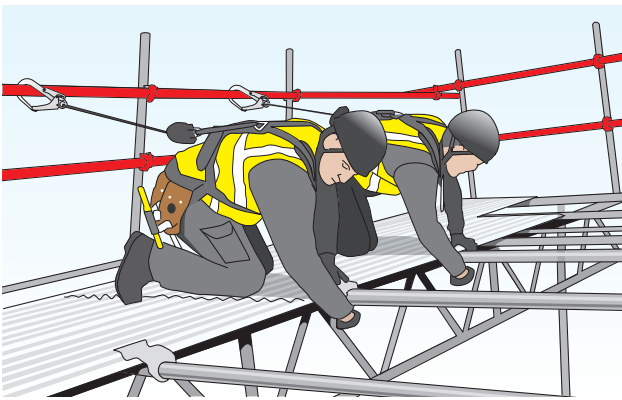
Scaffolders maintaining continuous attachment whilst fixing sheeting to a temporary roof
